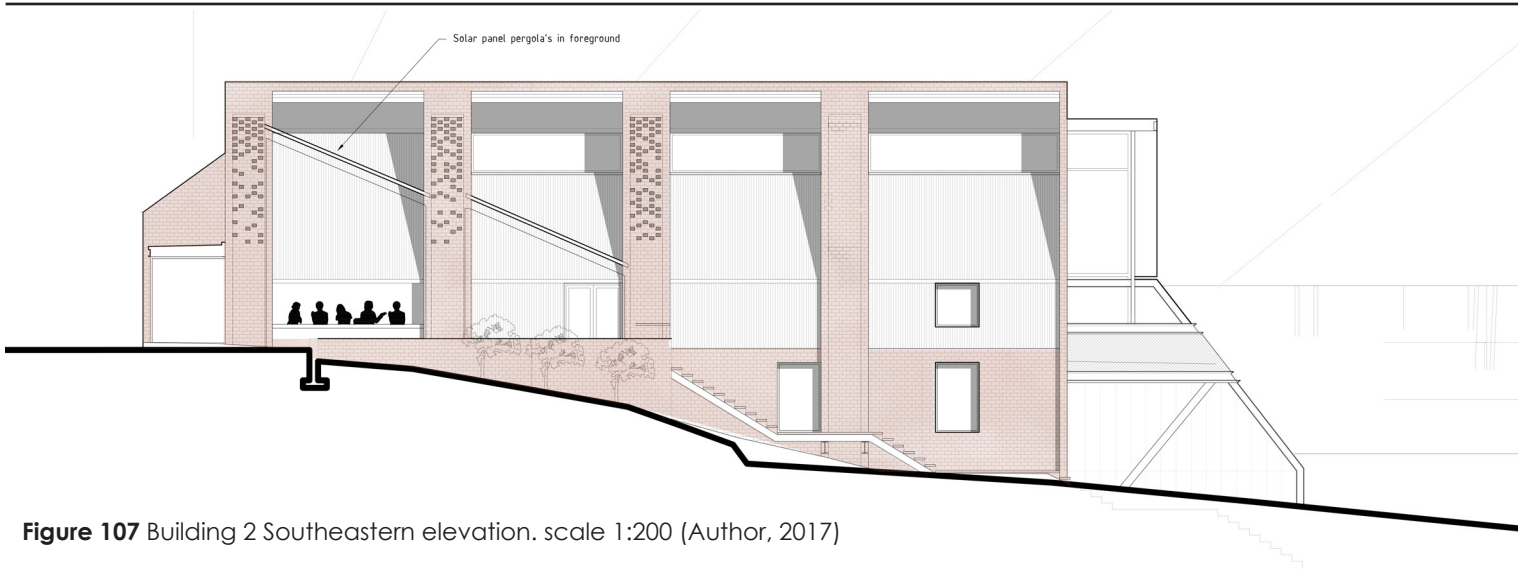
Building 2 Southeastern elevation. scale 1:200 (Author, 2017)
